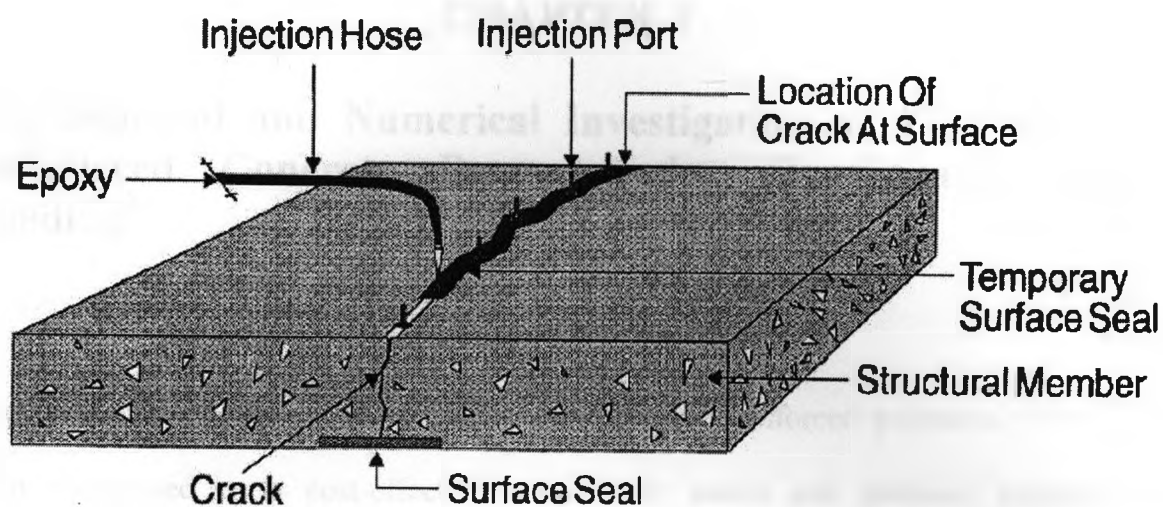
Crack repair using epoxy injection (From Sika Tech Guide, 1990).
